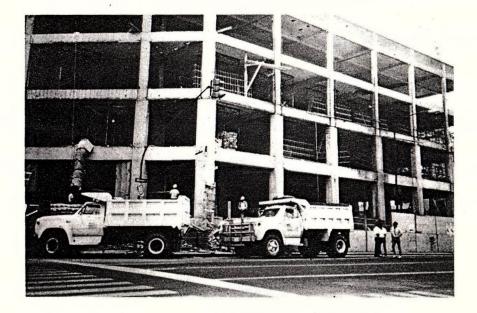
Jacketing of Reinforced Concrete Columns in Mexico City after the 1985 Earthquake
